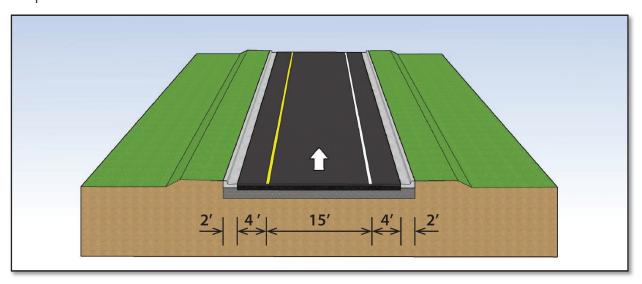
Existing Typical Section – Exit Ramp 6A
